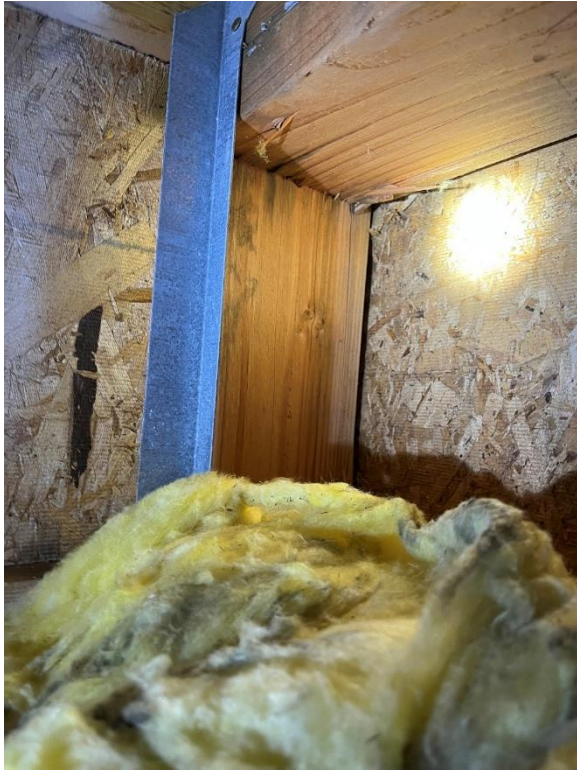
Minor Cracking of Top Plate at Top of Wall Stud
